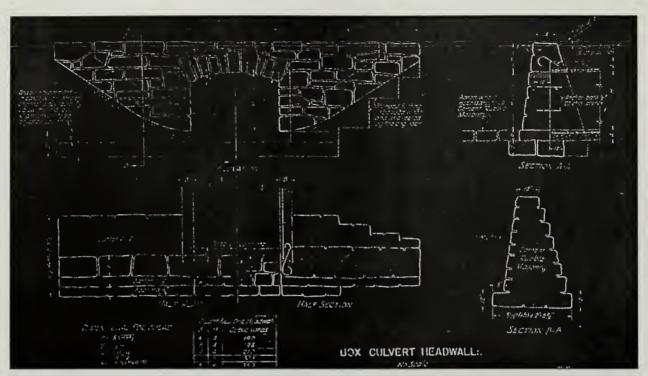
Details for a concrete box culvert on Day Mountain Road Extension, 1950. (U.S. Department of Commerce, Bureau of Public Roads, Project 9A2, Sheet 5 of 11, November 1950)
